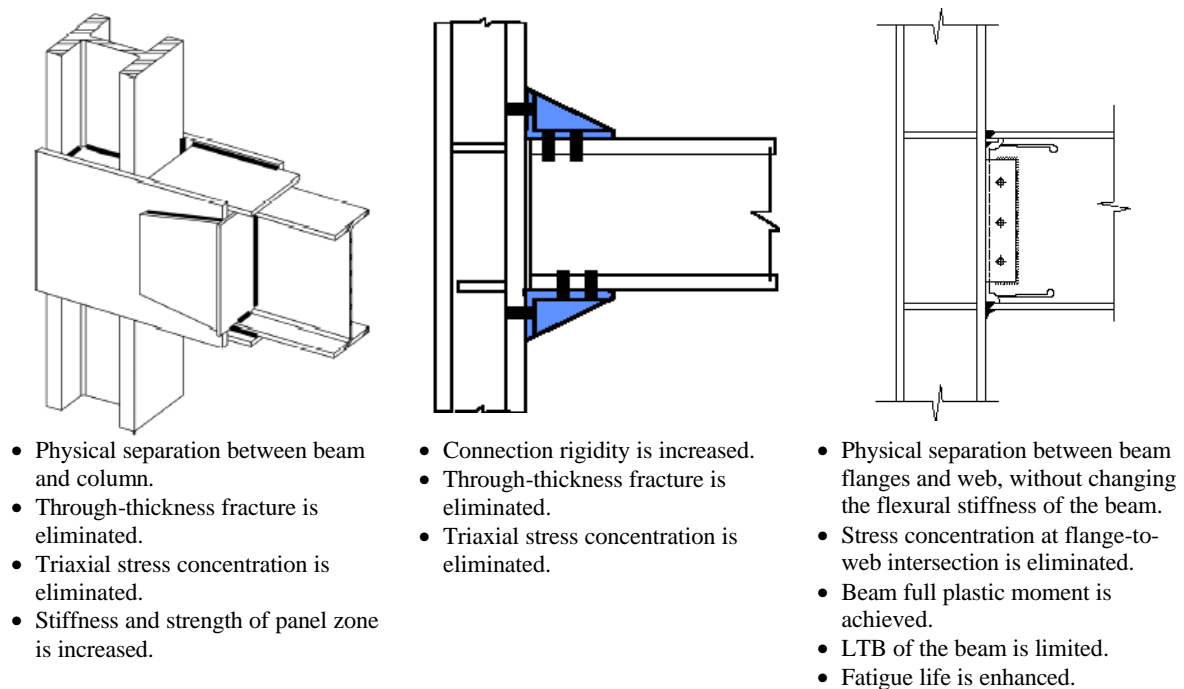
Proprietary connections for existing buildings and relevant advantages: side plate (*left*), bolted bracket (*middle*) and slotted beam web (*right*) (after FEMA 351, 2000).
